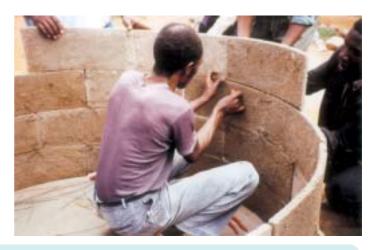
Assemble the pre-cast segments to form a tank body.
